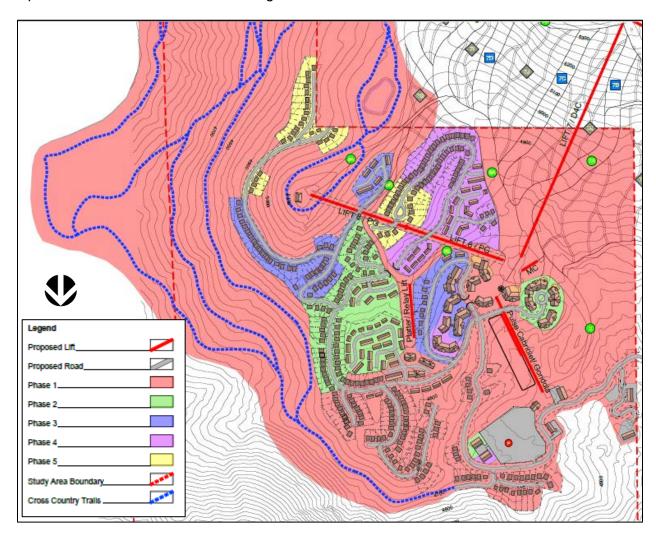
PHASING PLAN. Phasing plan for the Mission Ridge Expansion. (NTS)
